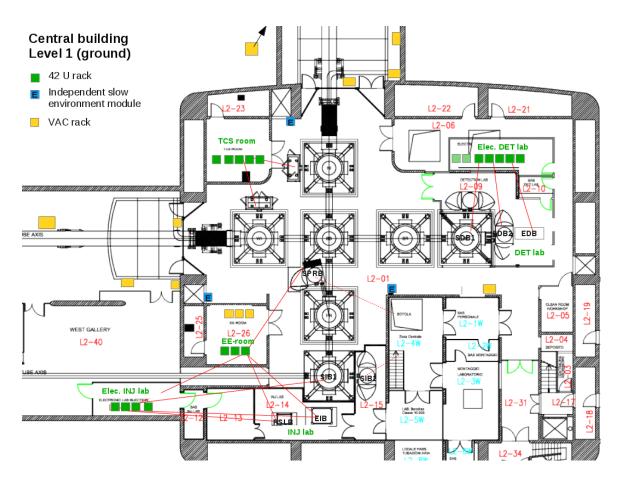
Central building, level 1 (ground). (One VAC rack is in the north tube outside the figure, as indicated by an arrow).
